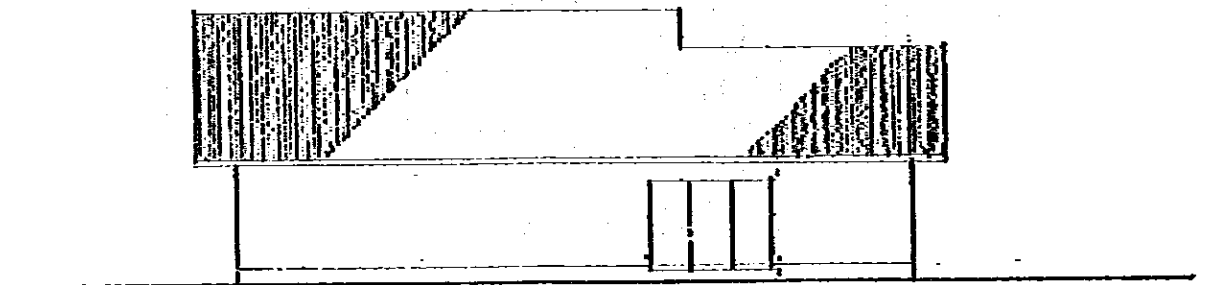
Floor Plan and General Drawings of Crop Protection Brigade
